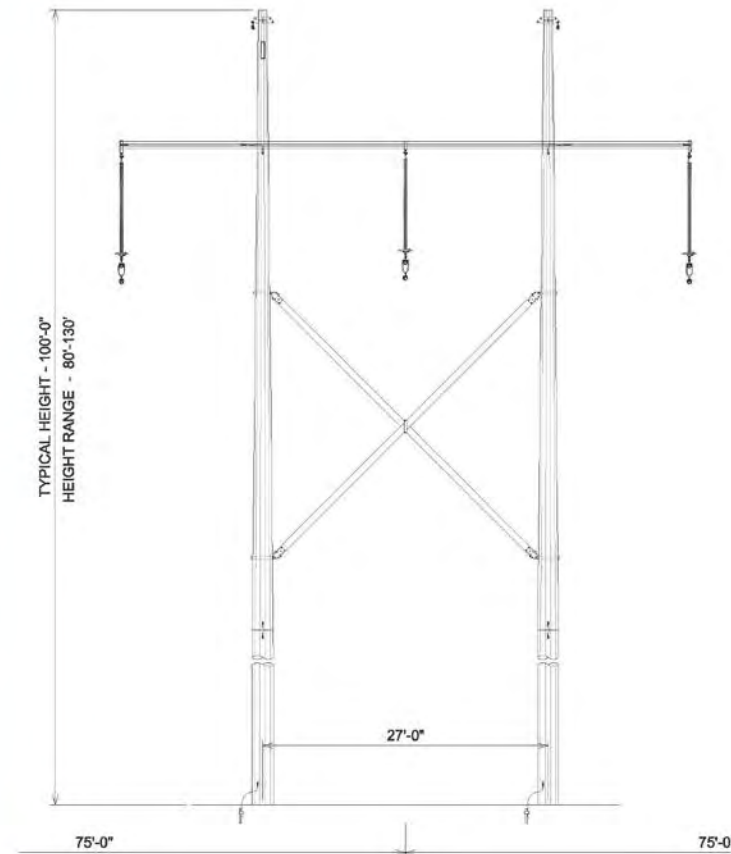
Typical Steel H-Frame Transmission Structure
